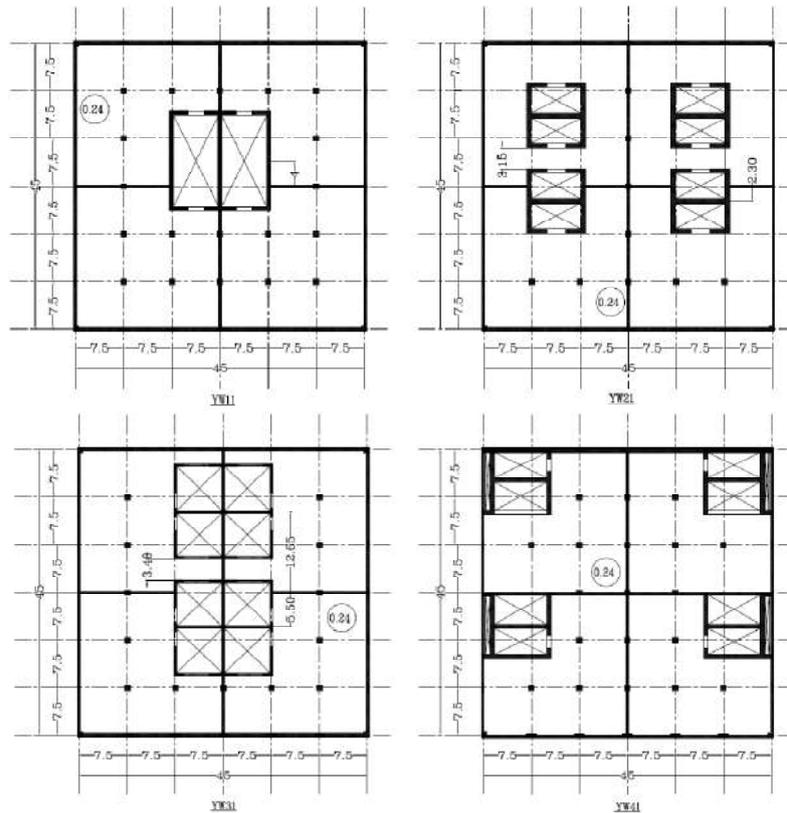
(Cont.) Structural Systems used in Core (Shear Wall) with Outrigger.
